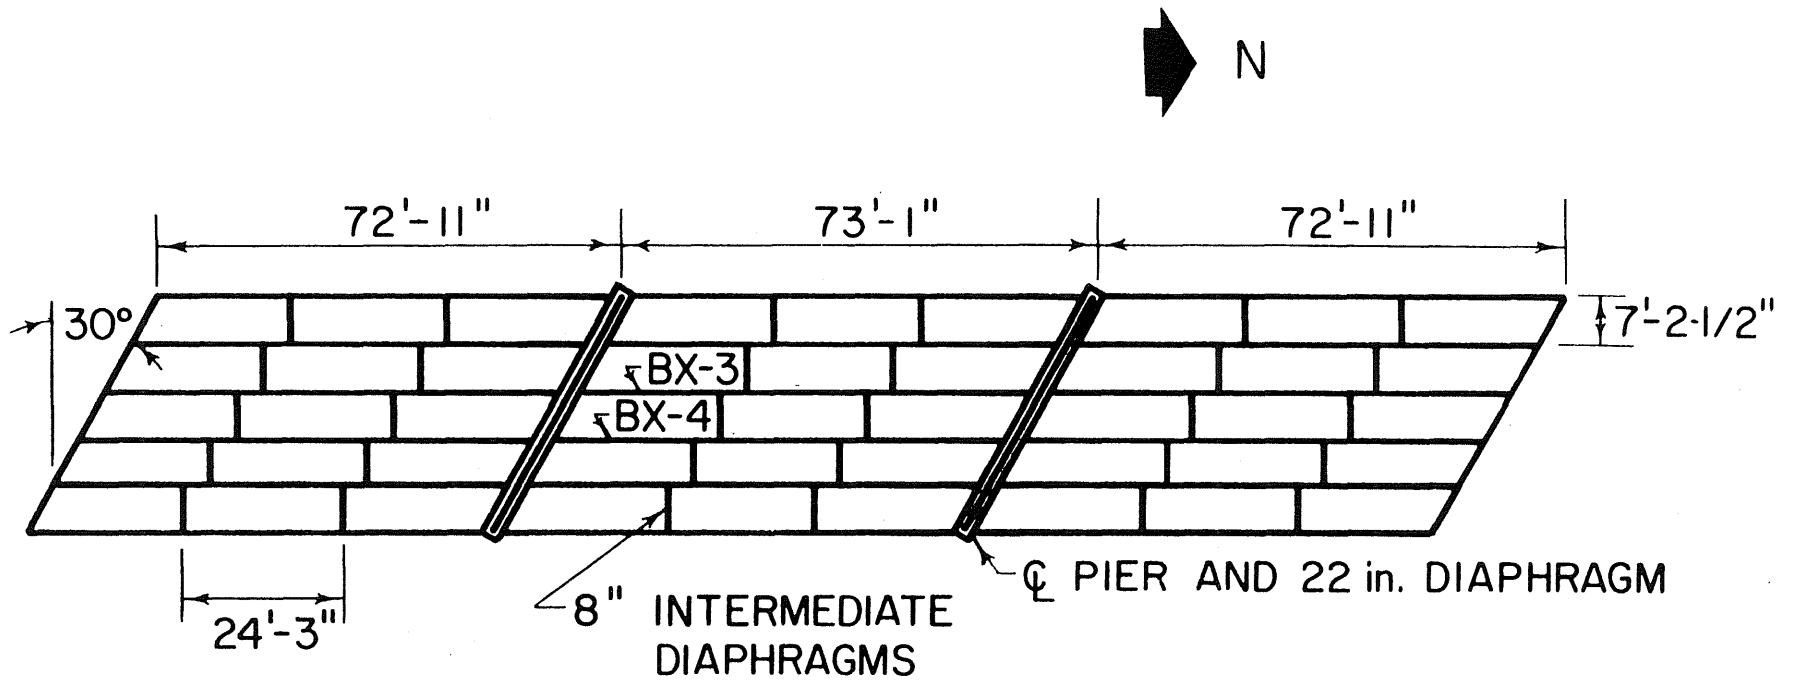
PLAN OF BRIDGE SHOWING GIRDER AND DIAPHRAGM PLACEMENT
